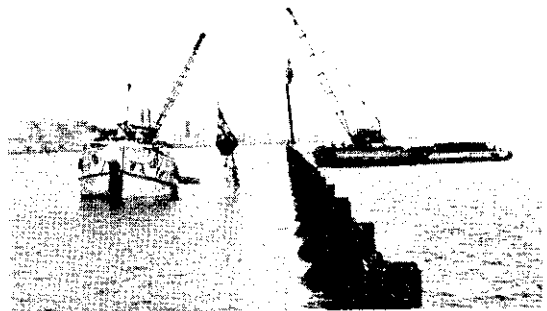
Soil filling behind steel blocks and sheet pile driving behind
